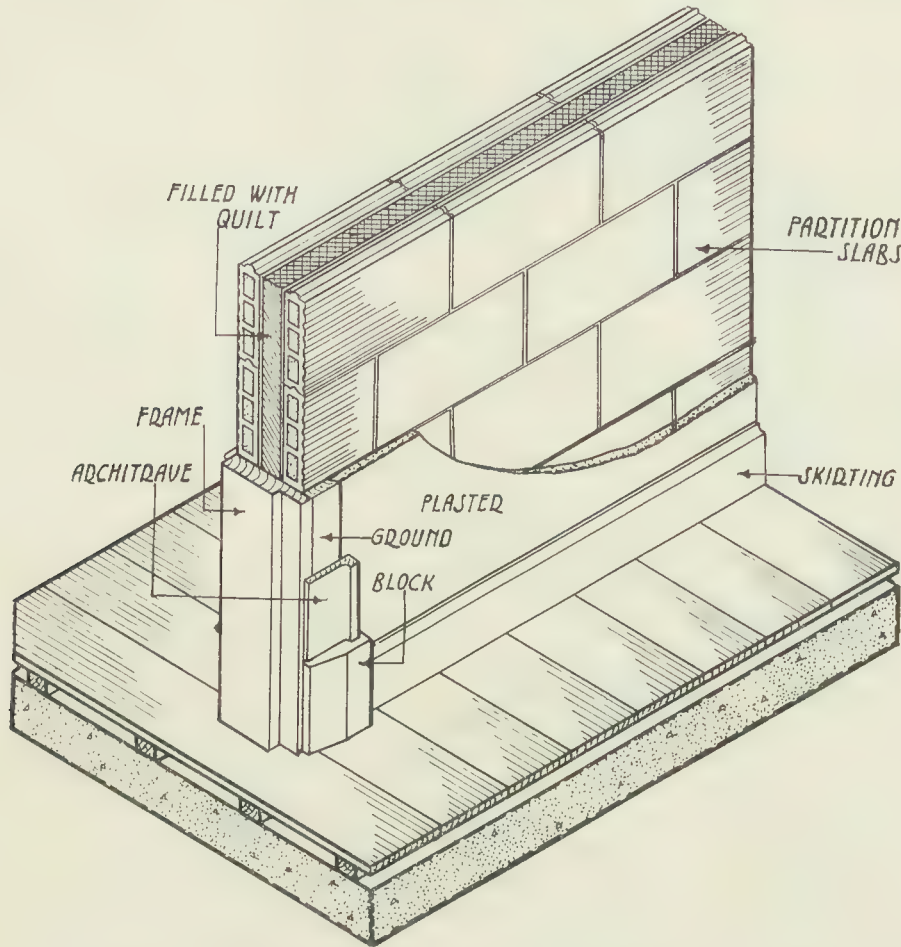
SOUND-PROOFING HOLLOW BLOCK PARTITION WALLS
